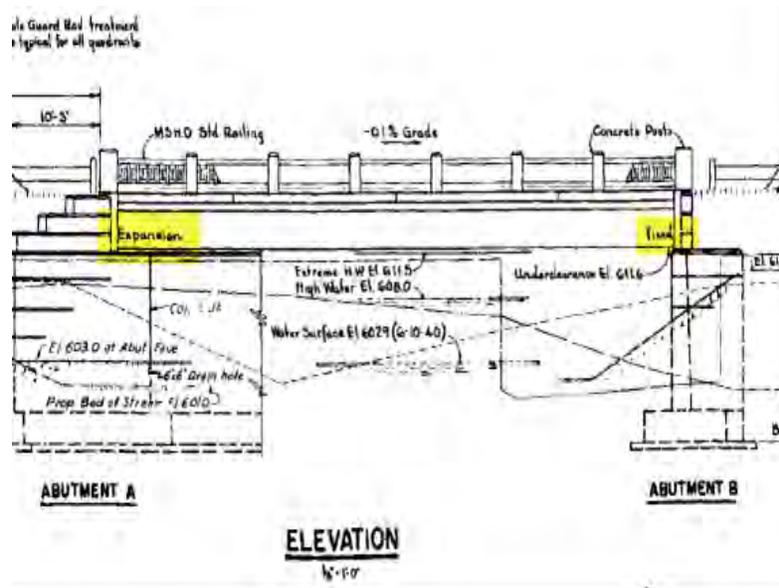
Review of the As-Built Drawings May Be Required for Proper Coding
